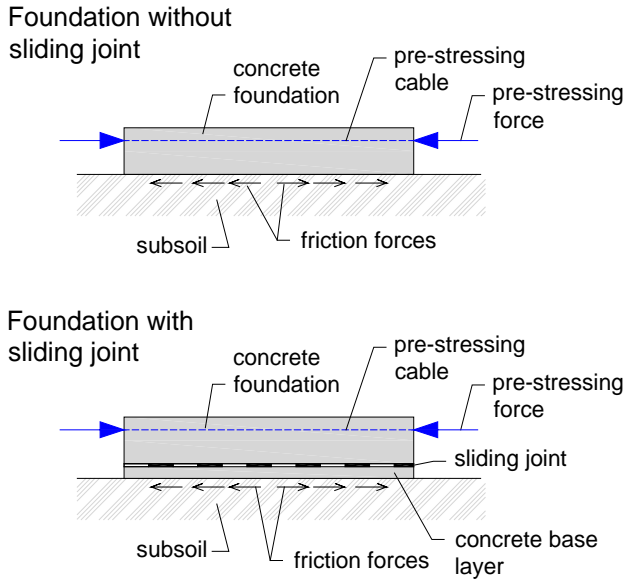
The scheme of pre-stressed foundation with and without sliding joint
